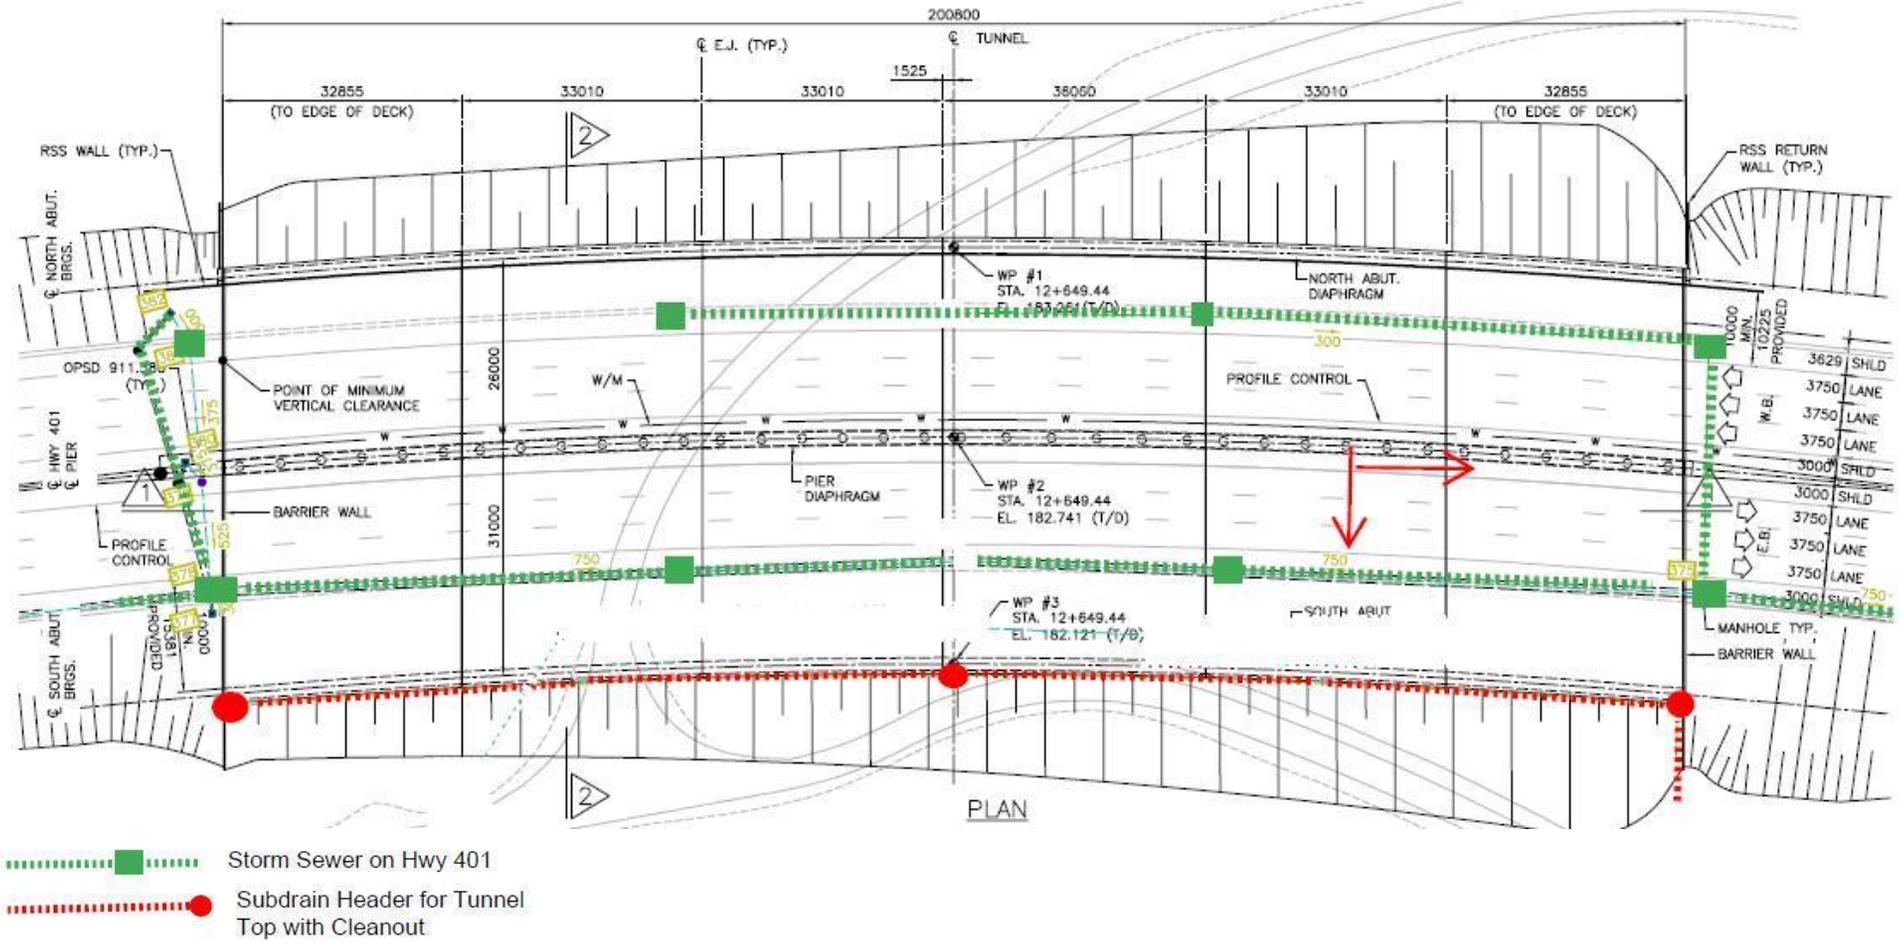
Layout of drains in a typical tunnel. Abutment drains have outlets to the storm sewer catchbasins, which are indicated here as green squares.
